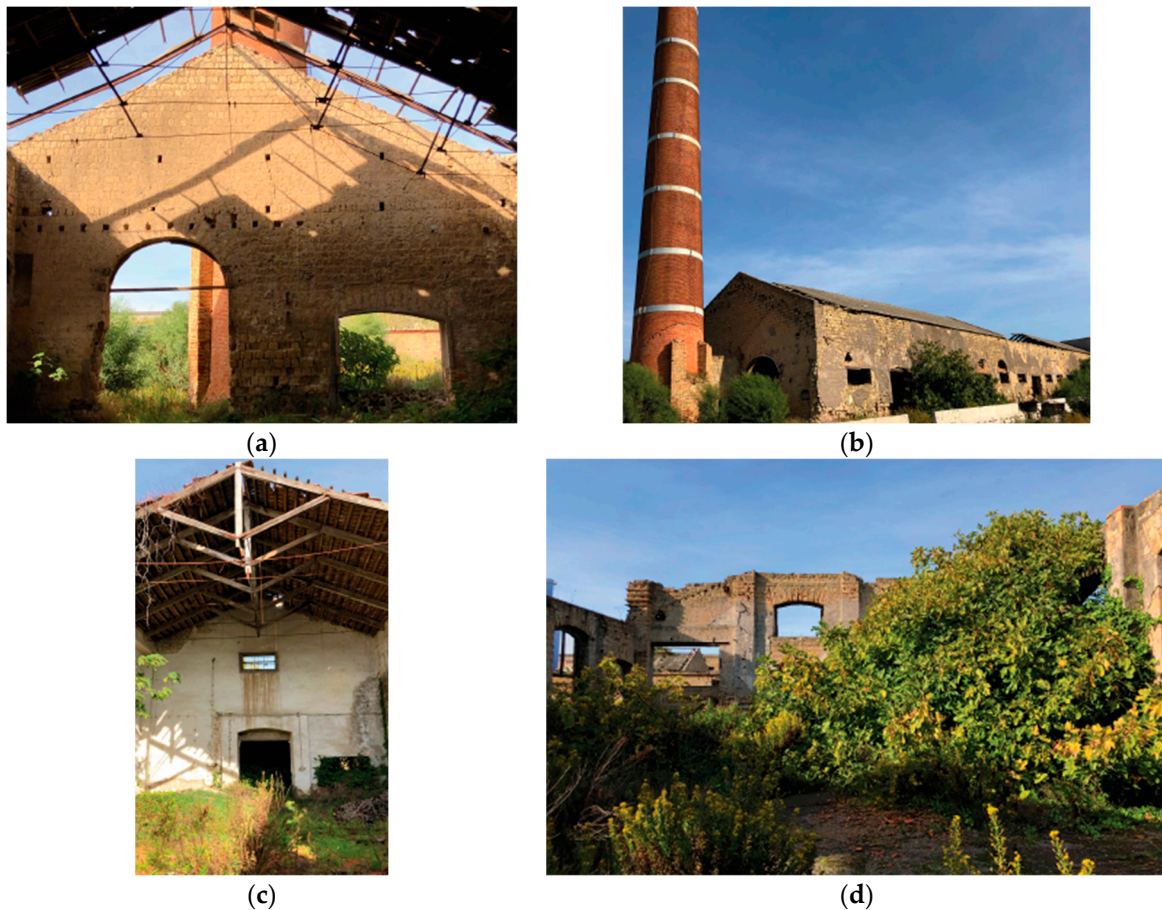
(a) A typical construction in the area; (b) the last chimney; (c) detail of a roof structure visible due to the failure of a vertical masonry wall; (d) invasive vegetation.
